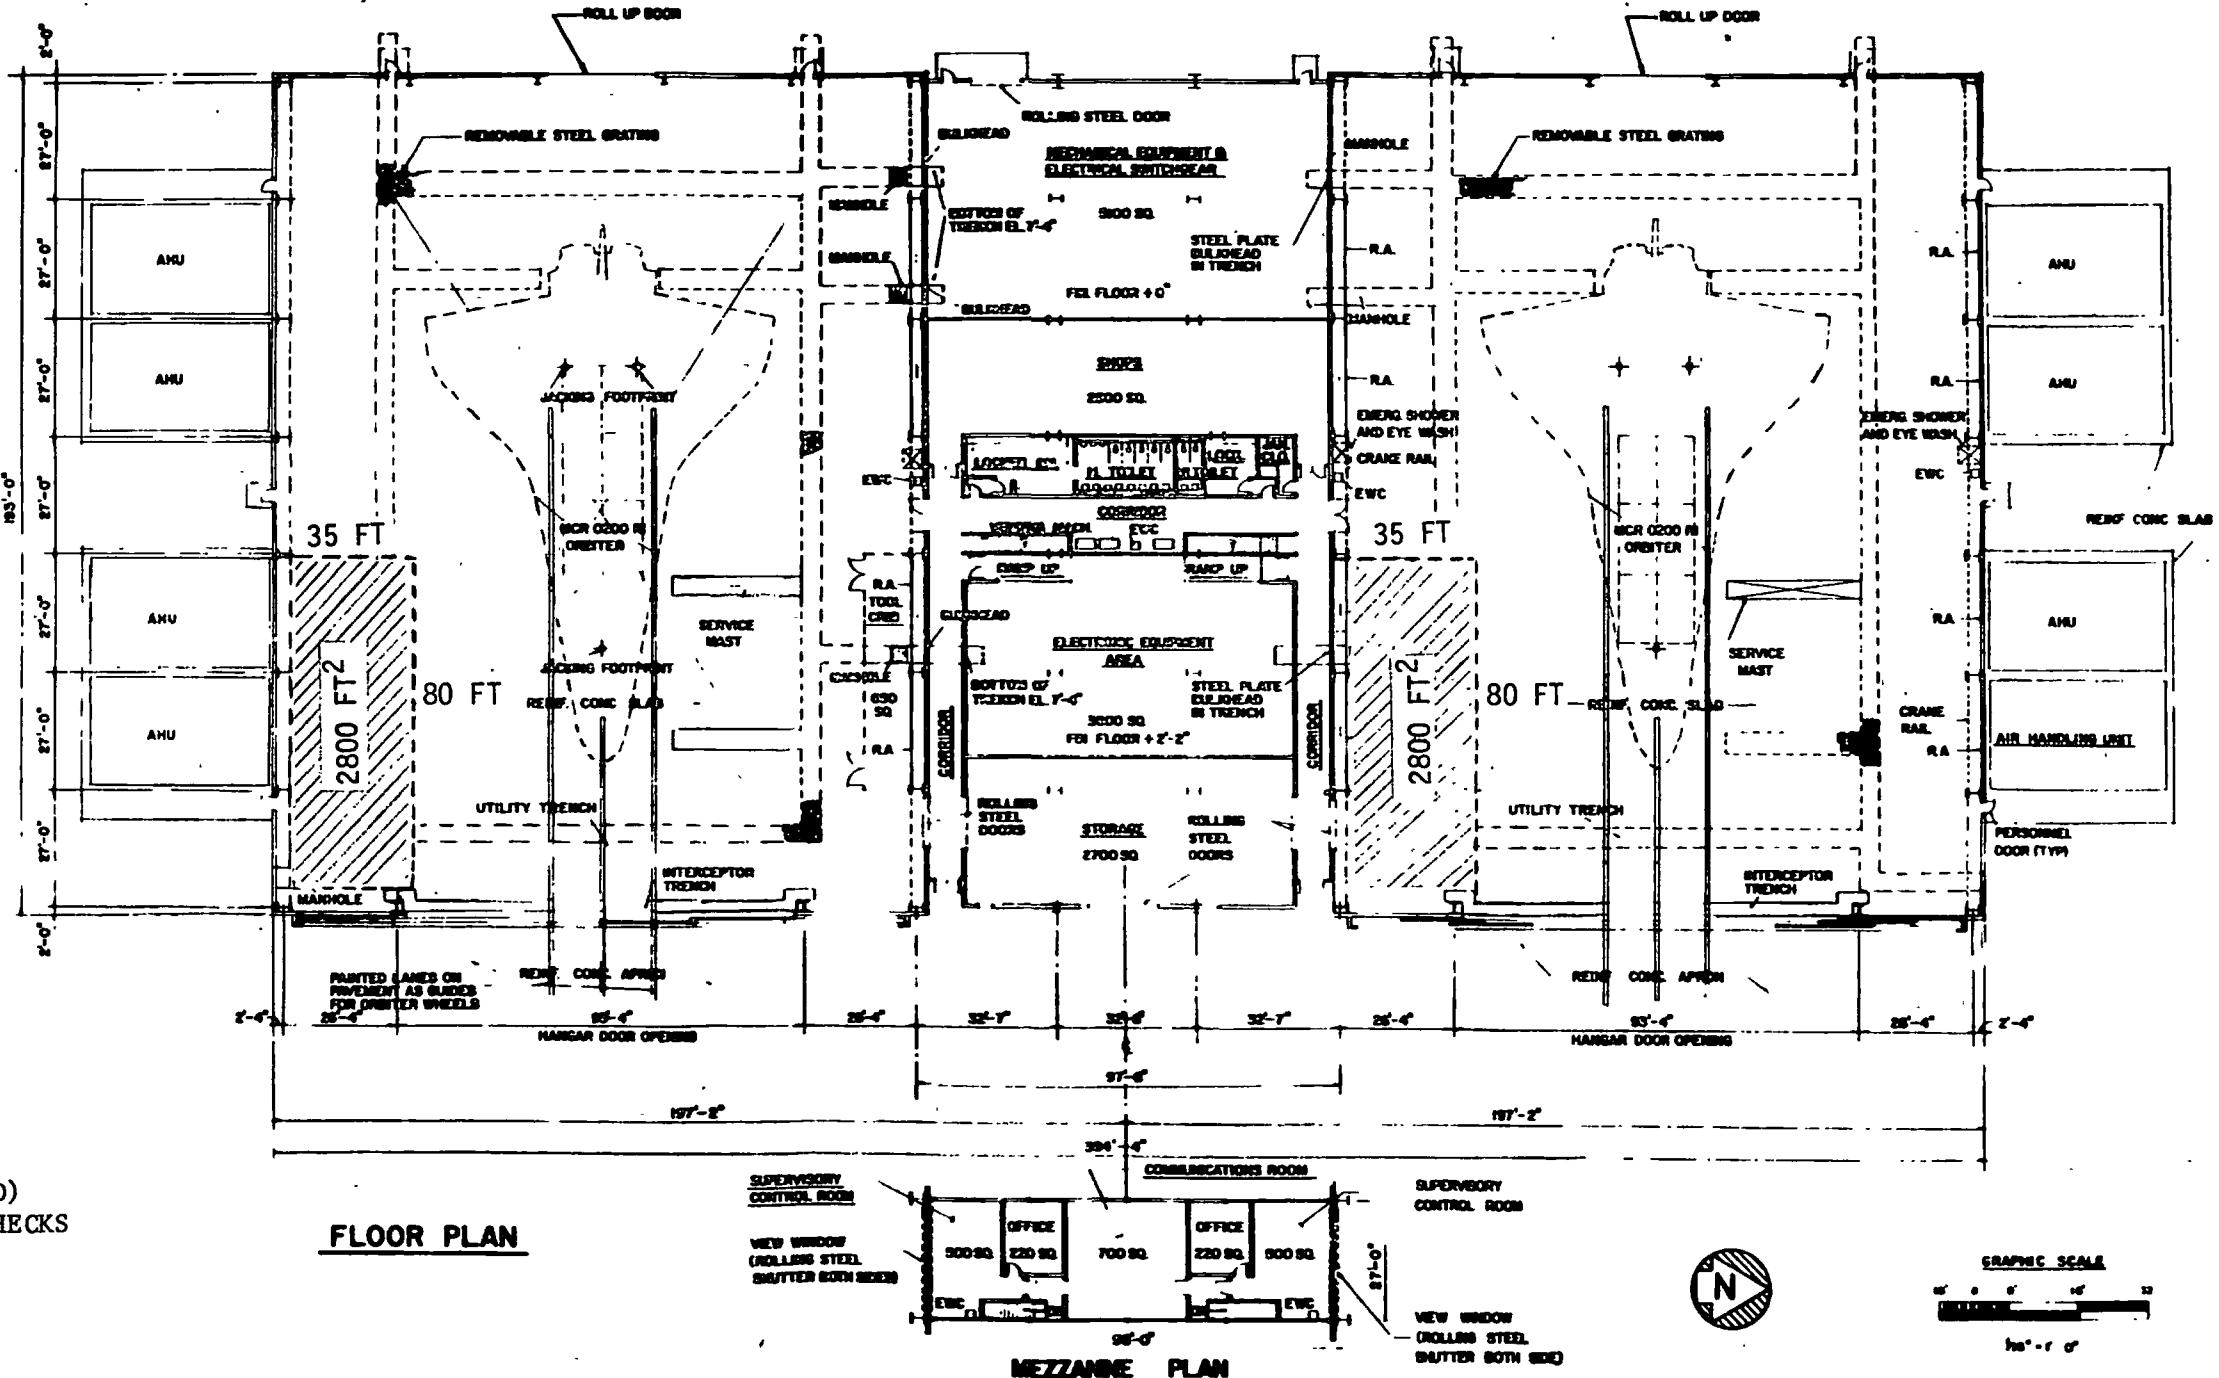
Orbiter Processing Facility (OPF) - Floor Plan
